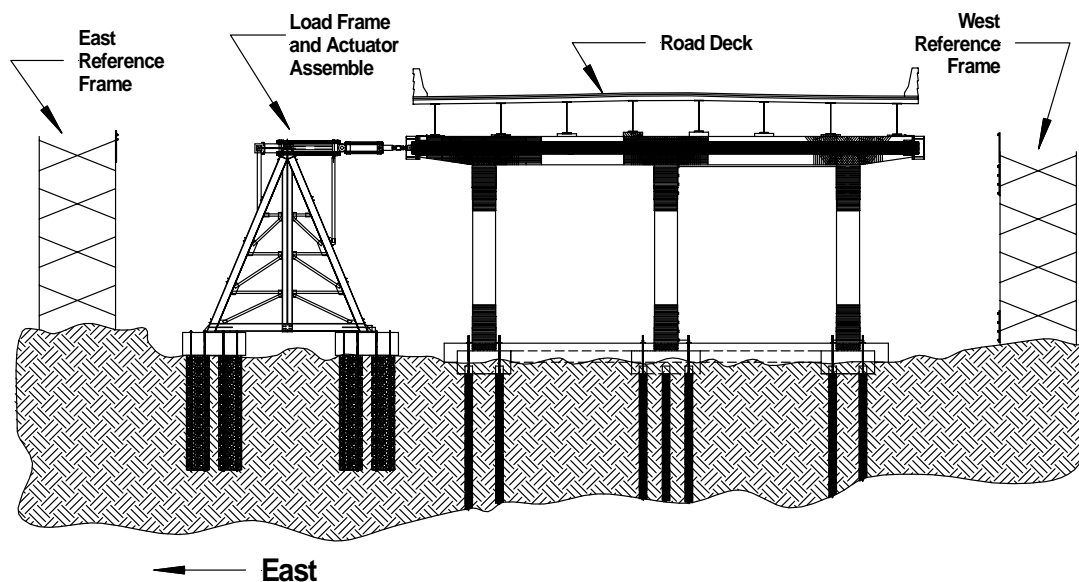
Elevation of test set-up for the May 6th and 9th 2000 Bent #6S tests
